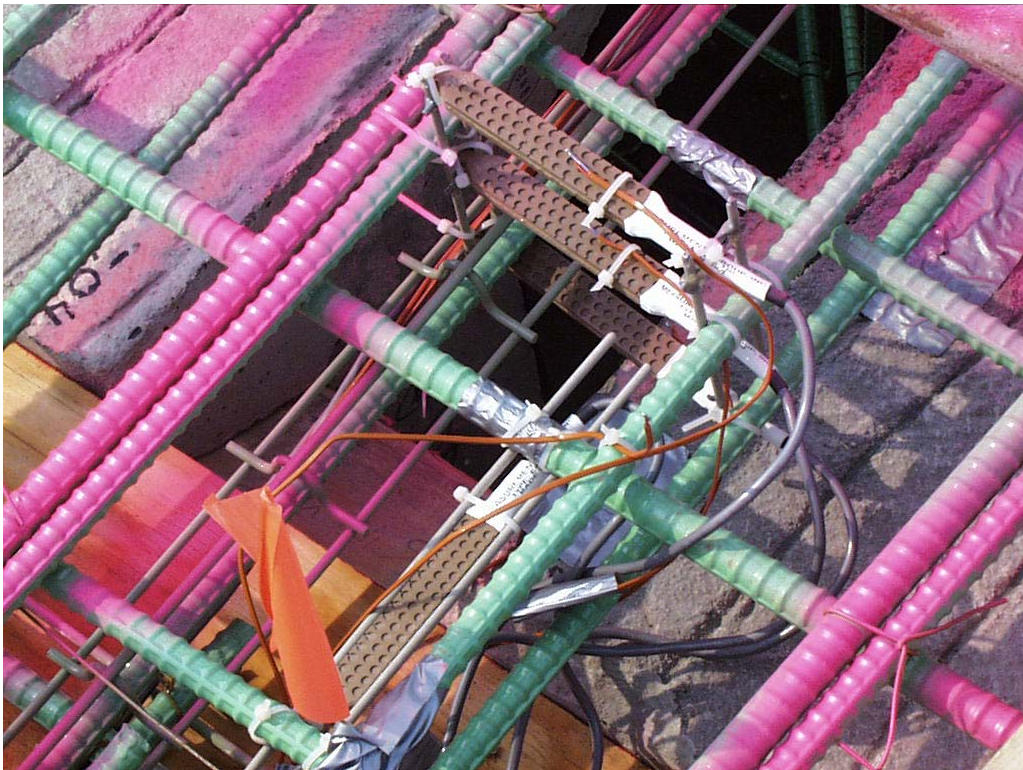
Sensors installed at location C, over pier, edge of deck, Big Creek
